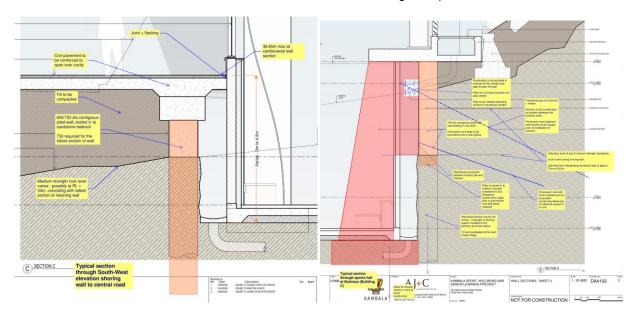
Left – section through shoring wall to central access road at sports hall. Right – section through shoring wall to embankment at sports hall
